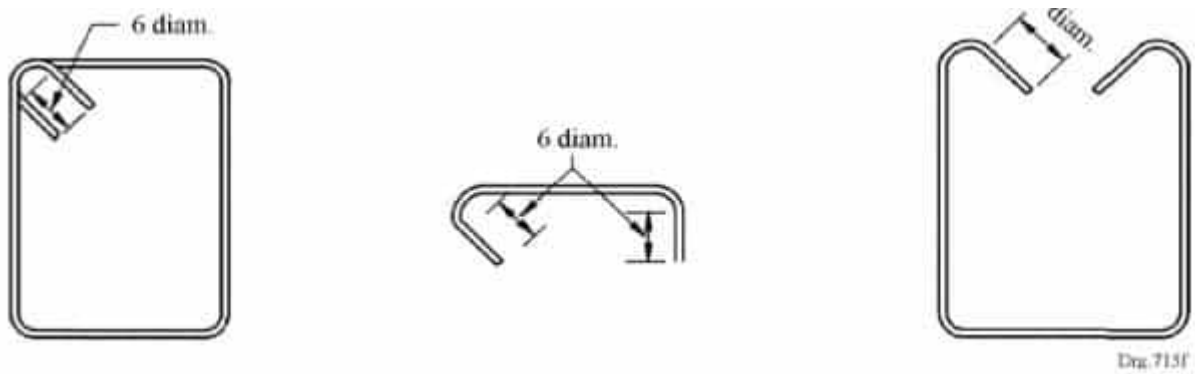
Seismic shear stirrup reinforcing detailing requirements
